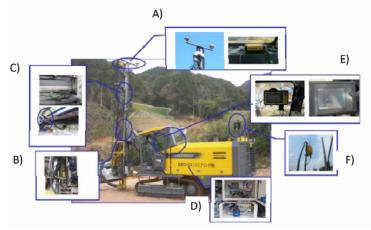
Intelligent crawler drill (Details of each part will be described in 3.1.1)
